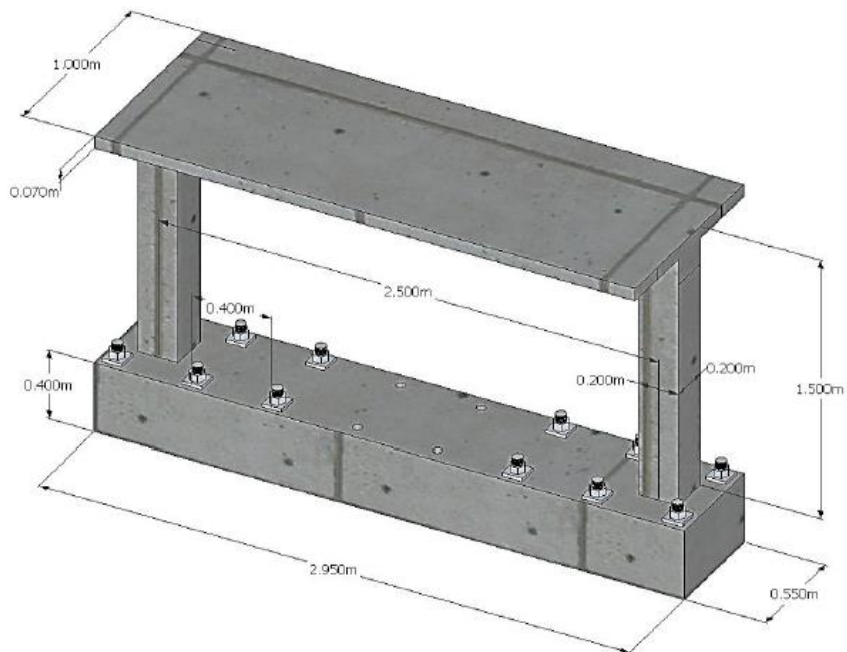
Dimension Details of Reinforced Concrete Frame
